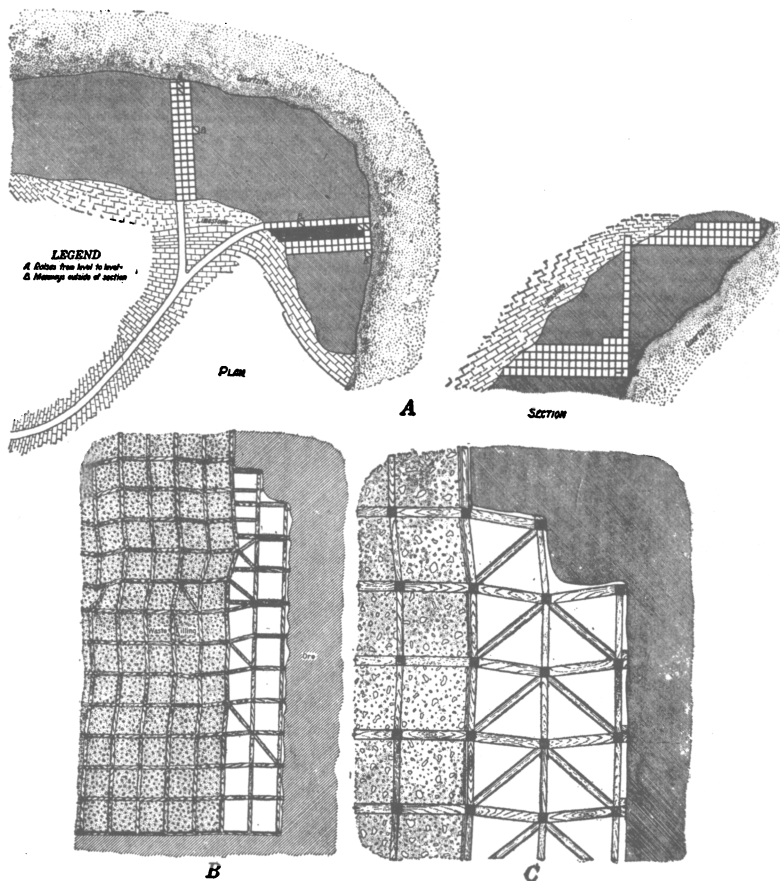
A, First step in starting a stope, Tintic Standard mine; B, vertical section of stope, showing method of timbering; C, horizontal section through stope, showing use of diamond bracing.
